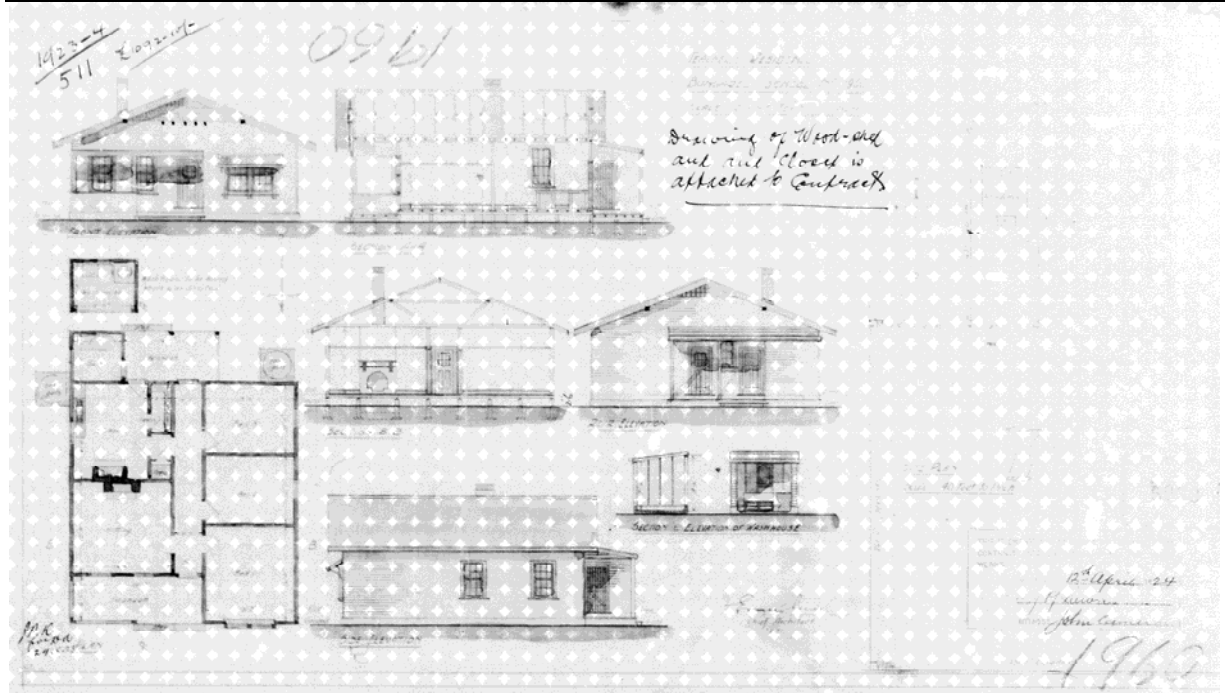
'Teacher's Residence Bungaree School No. 1960', plan, elevations & sections, 12 April 1924.
